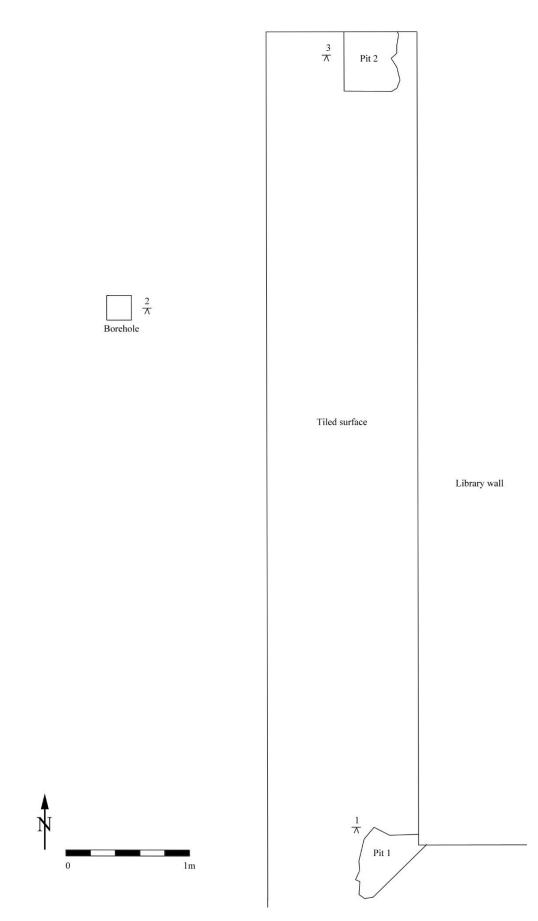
Plan of the groundworks on site. Original drawn at 1:20
